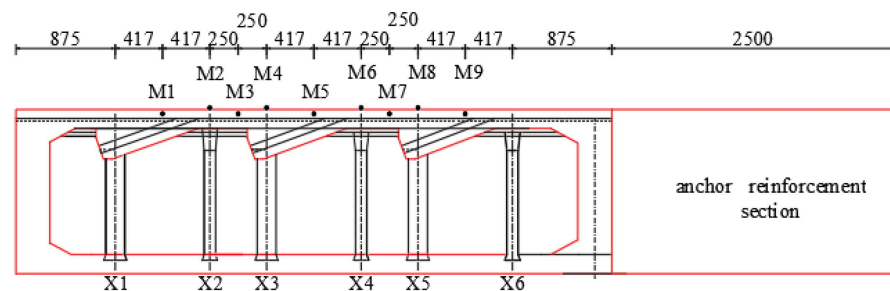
Longitudinal bridge arrangement of transverse pre-stressed reinforcements on the top plate (unit: mm).
